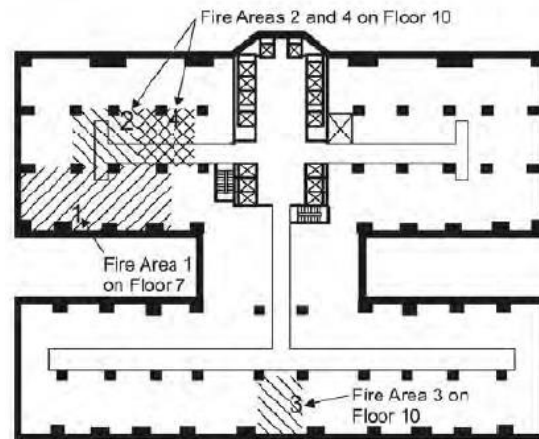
The 30 Church Street office building. Typical floor plan. Image extracted from [8].
